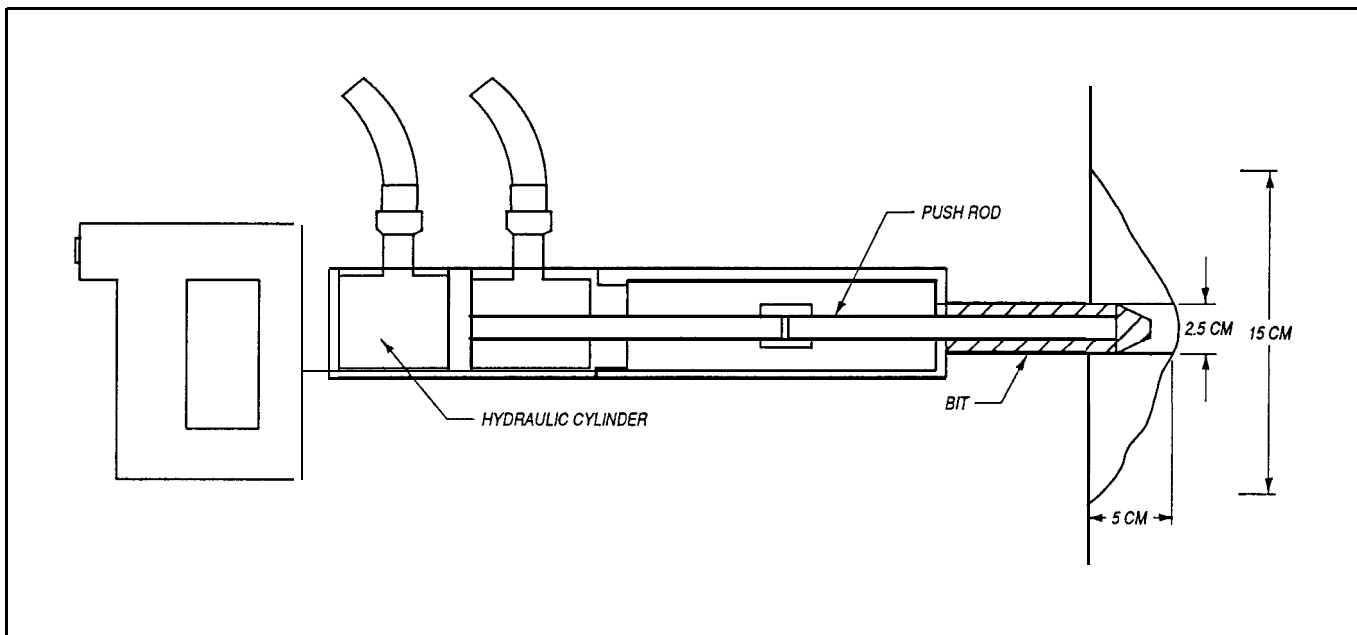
Concrete spaller (Source: Esposito et al. 1987)
